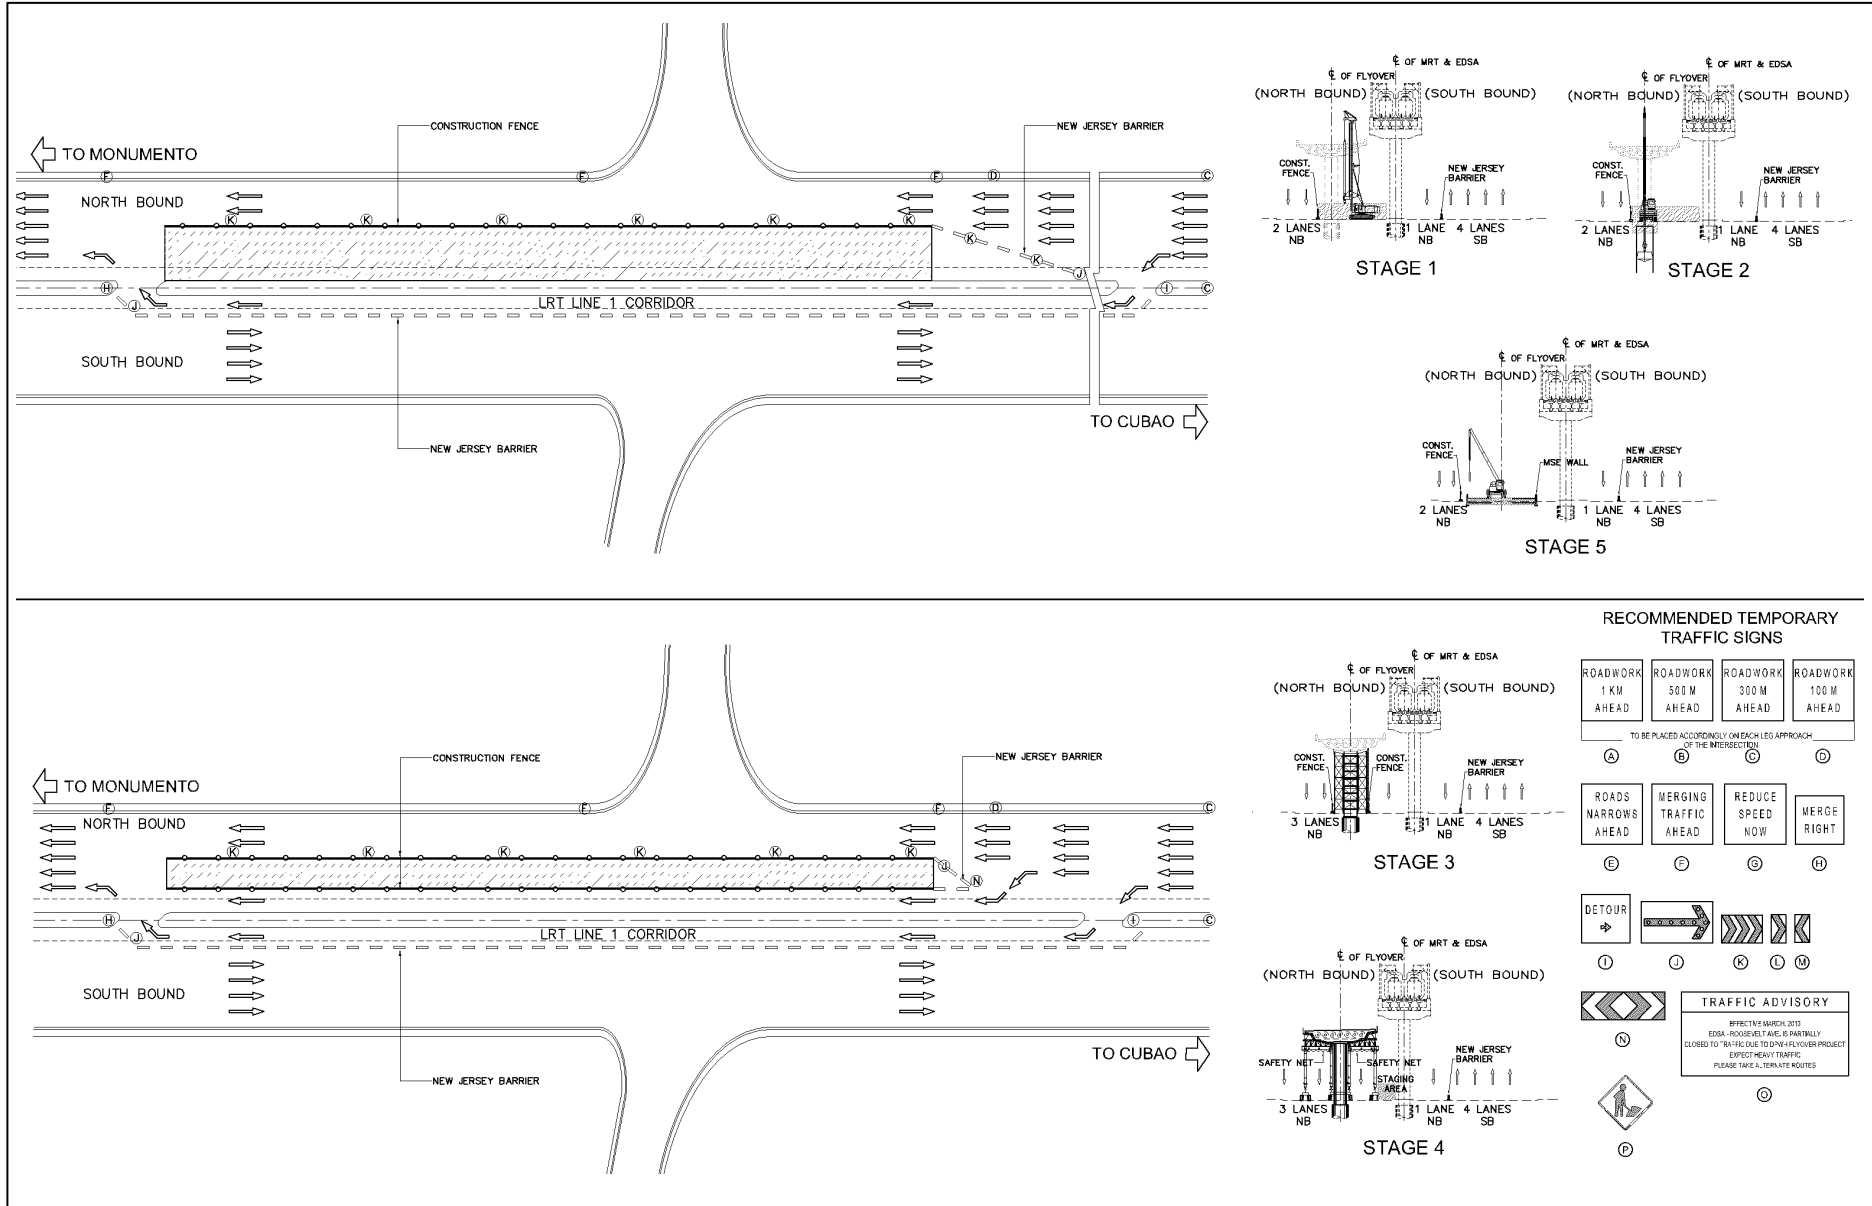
Construction Plan for EDSA/Roosevelt/Congressional Interchange (2/2)
